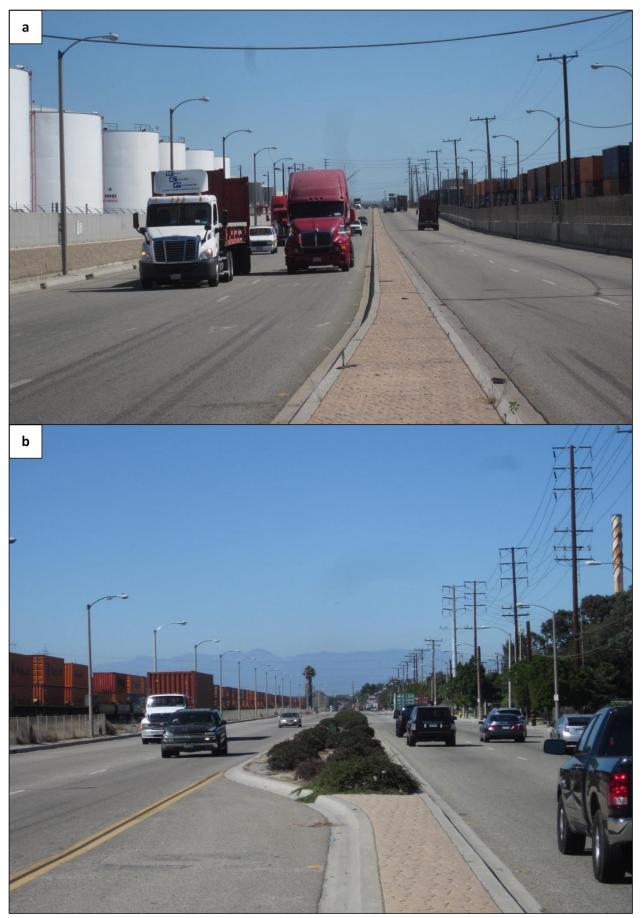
Alameda Street at Carson, CA prior to infrastructure construction (a – southbound, b – northbound)
